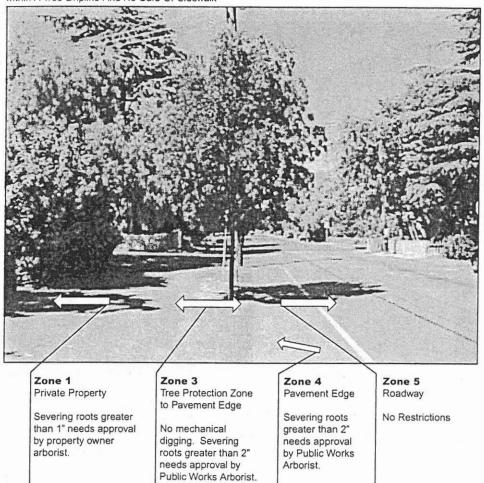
Restriction Zones For Excavation, Trenching Or Boring within A Tree Dripline And No Curb Or Sidewalk
